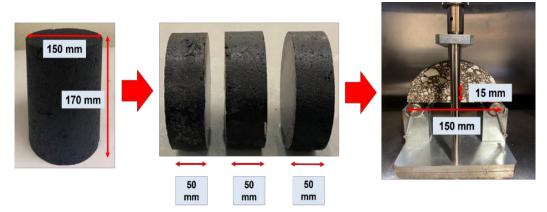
SGC specimen, reduced samples, and the SCB sample positioned in the supporting apparatus.
